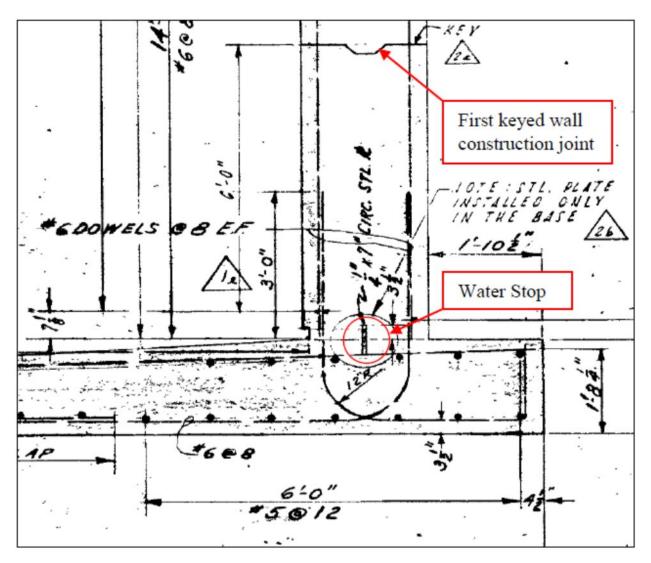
SX Farm Base Footing and Wall Reinforcing [10]
